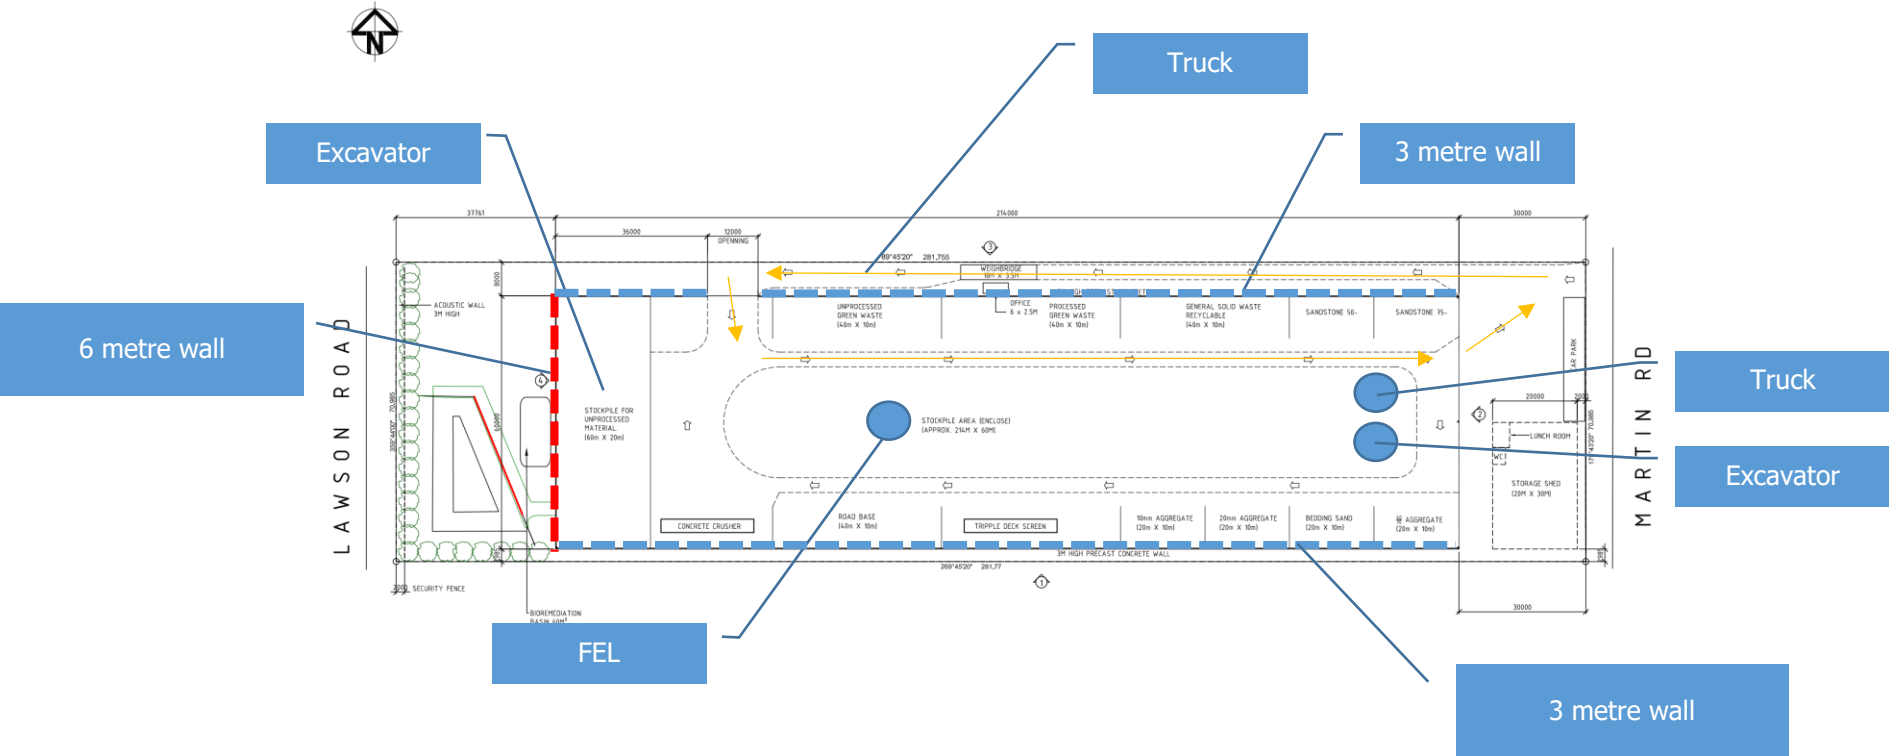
Site Plan showing Barriers & Source Locations – Scenario 3
